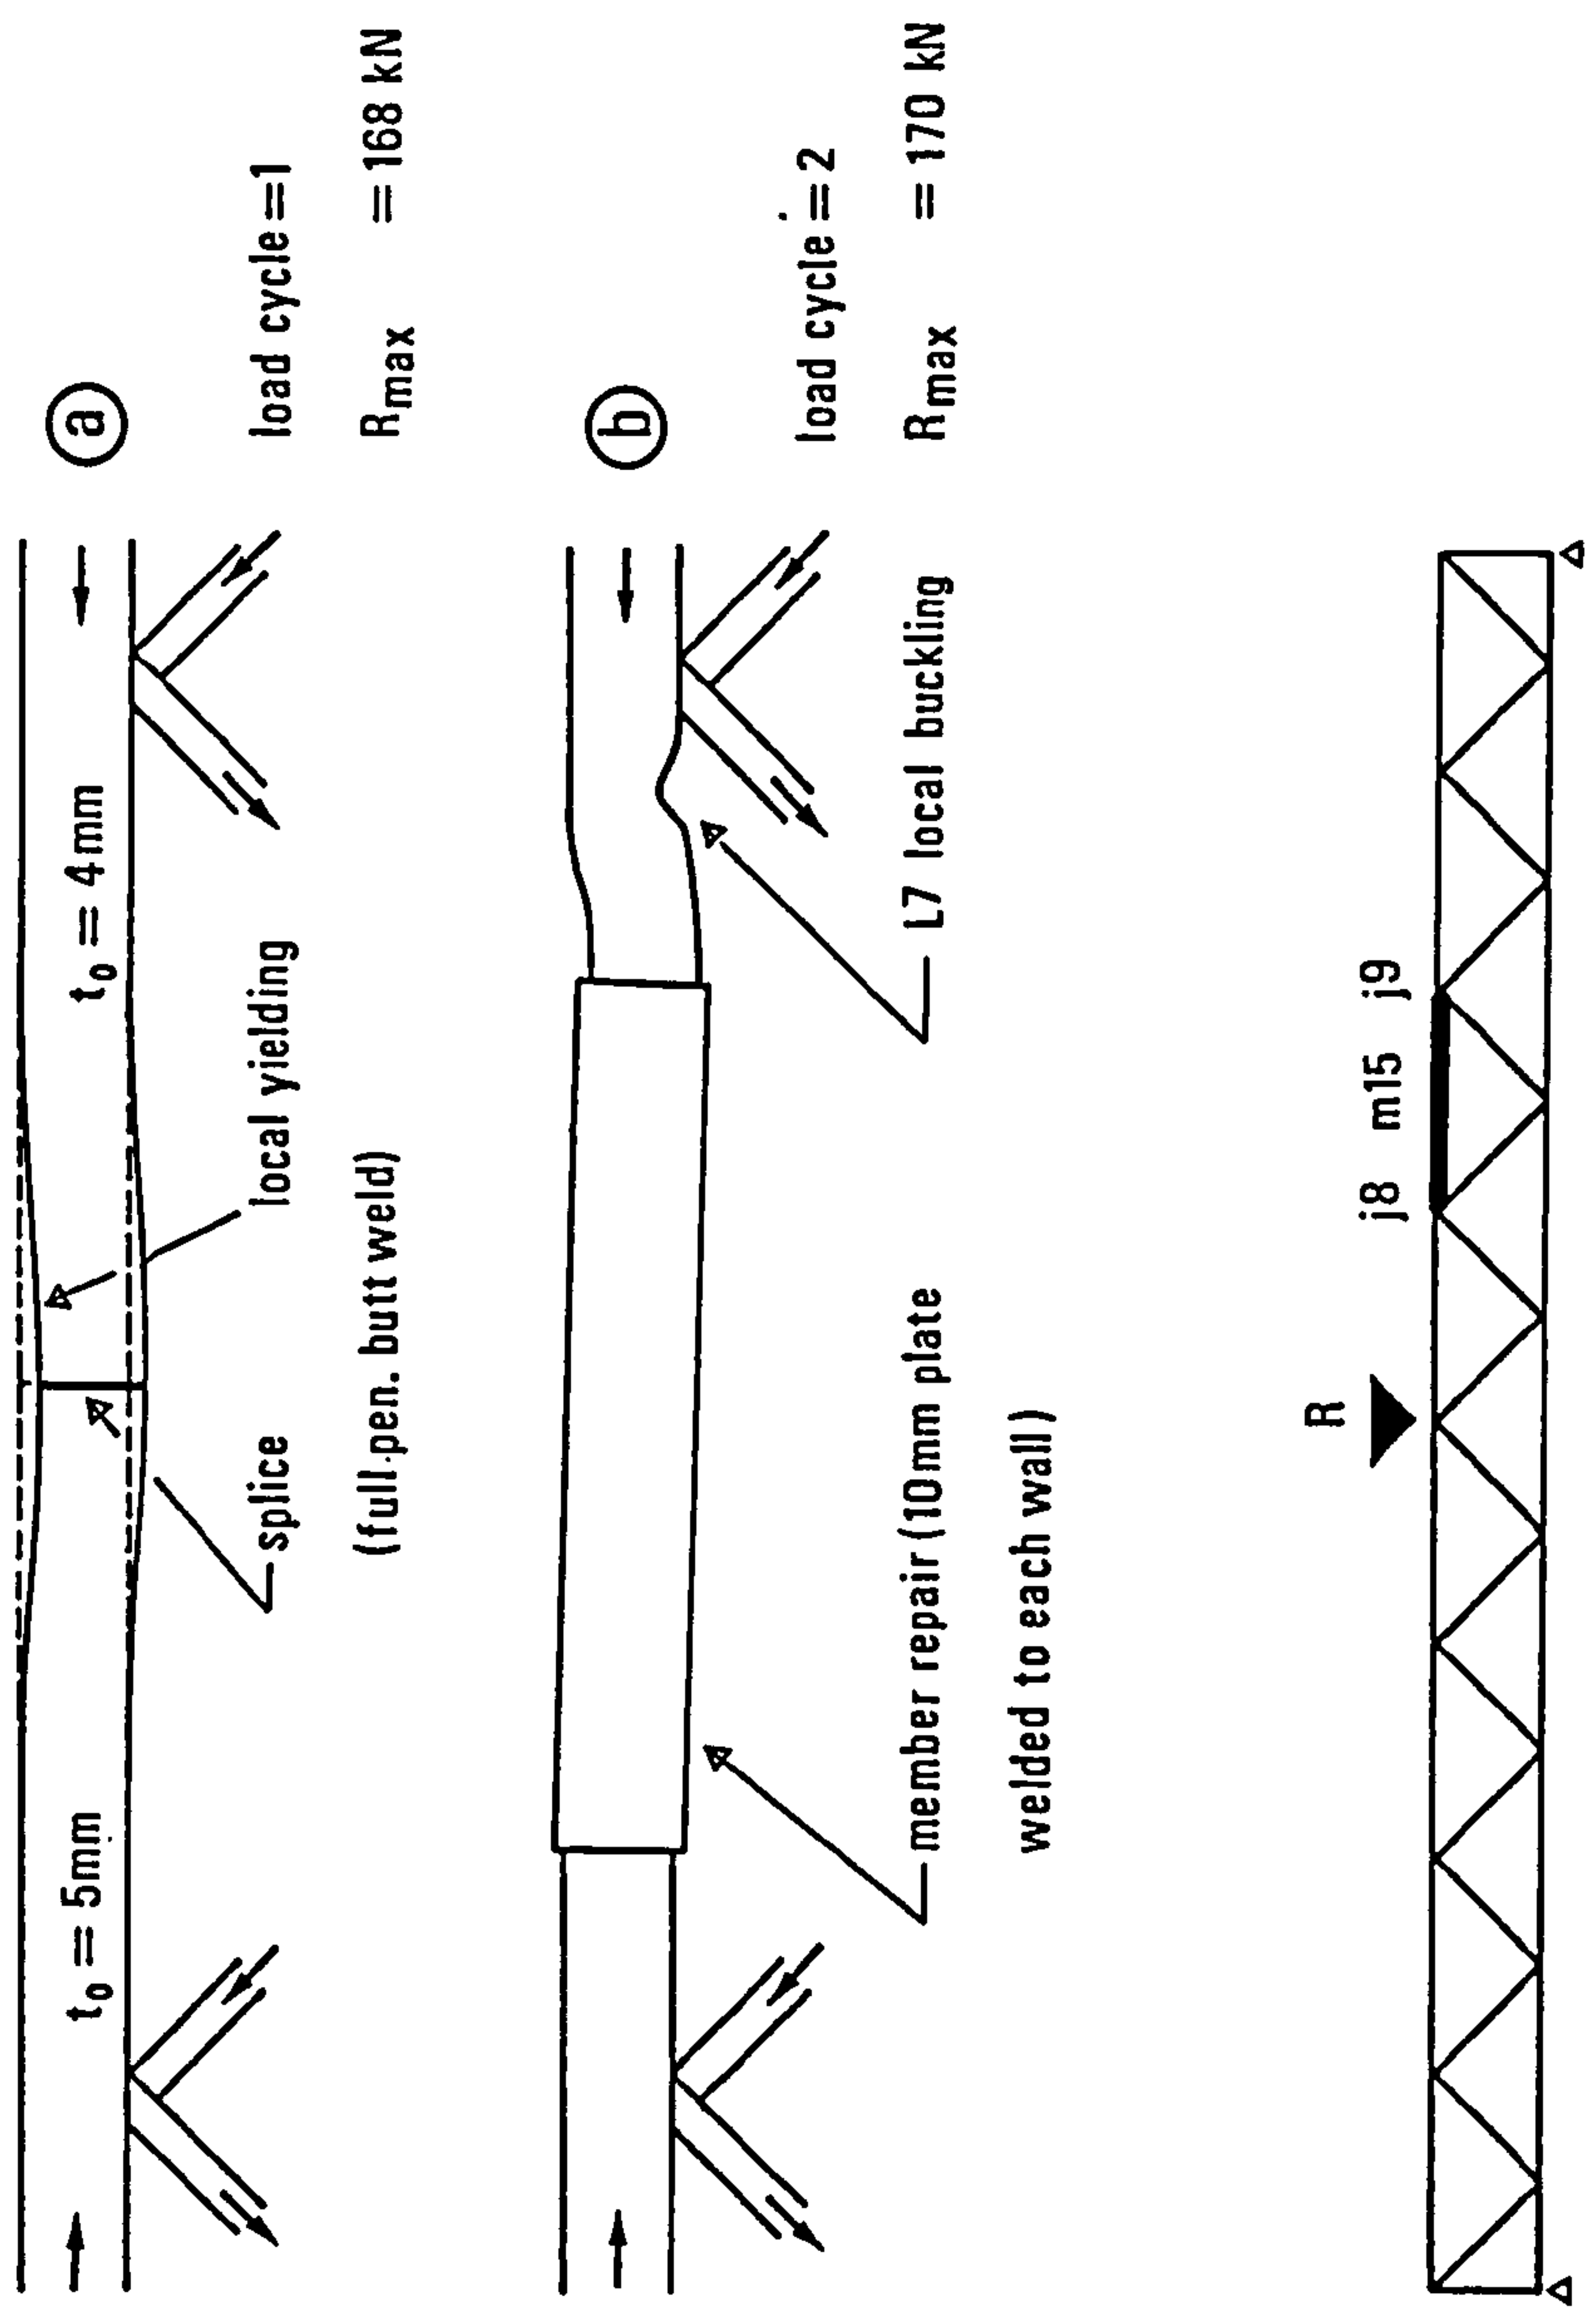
Failure of the compression chord in truss T2.
